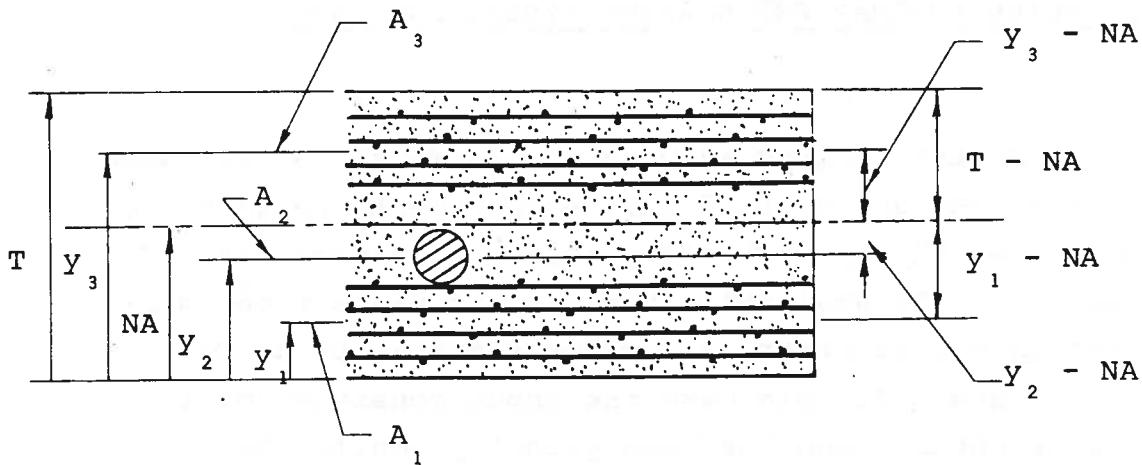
Transverse section through a ferro-cement specimen, showing nomenclature.
